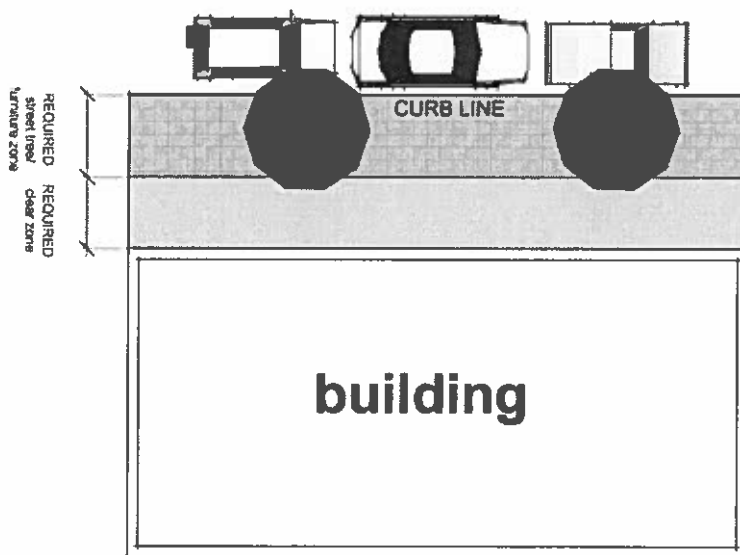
On-street parallel parking - standard design adjacent to the curb.
